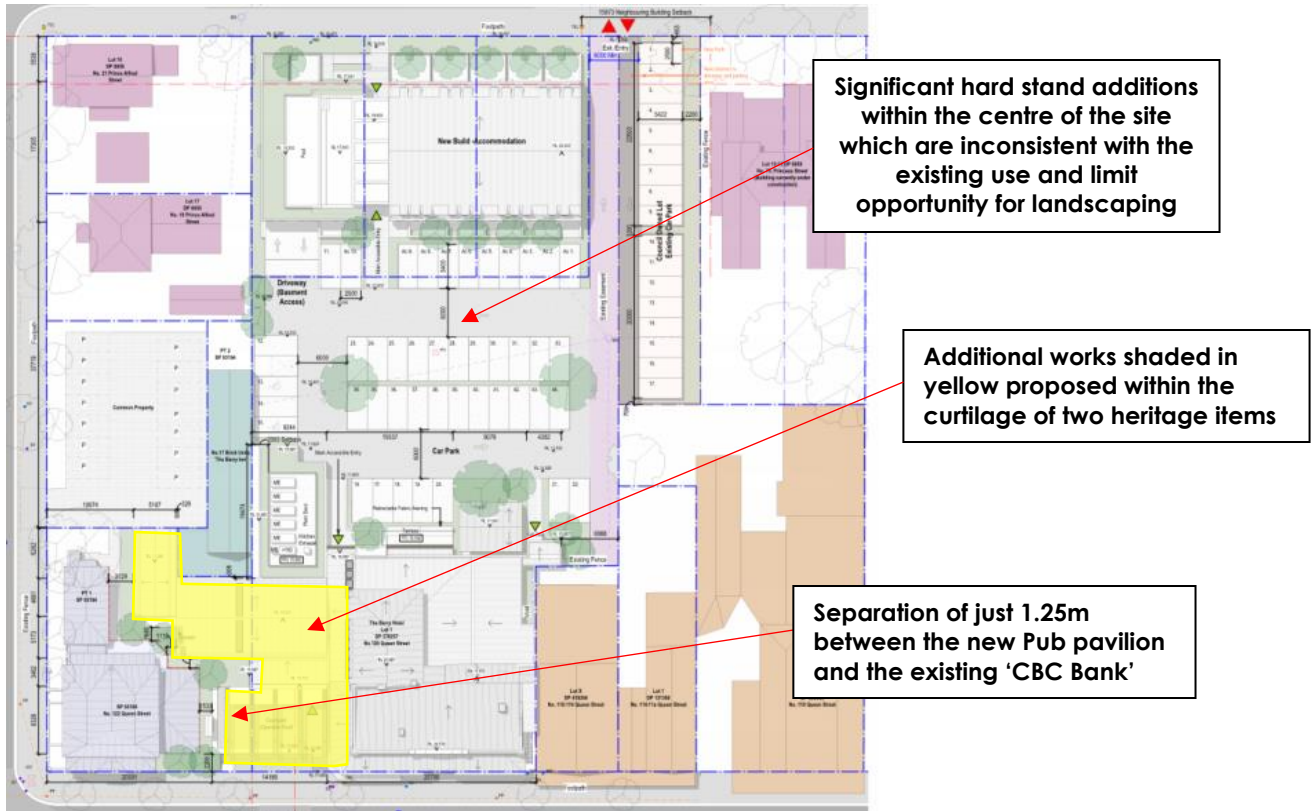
Extract from proposed Site Plan identifying the level of development proposed to Queen Street frontage (H&E Architects, 2023)
